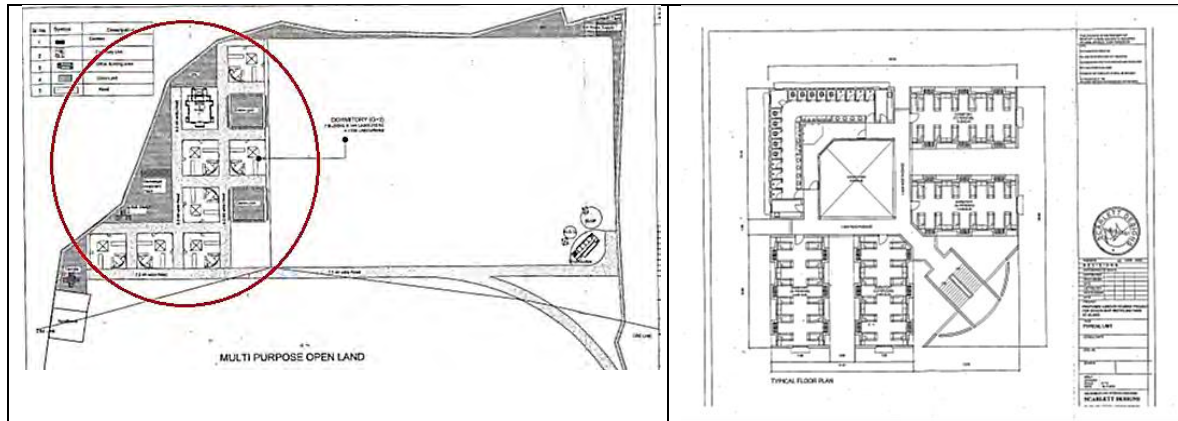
Construction of 7 Buildings and Ancillary Facilities, Floor Plan (12 beds x 4 rooms)
